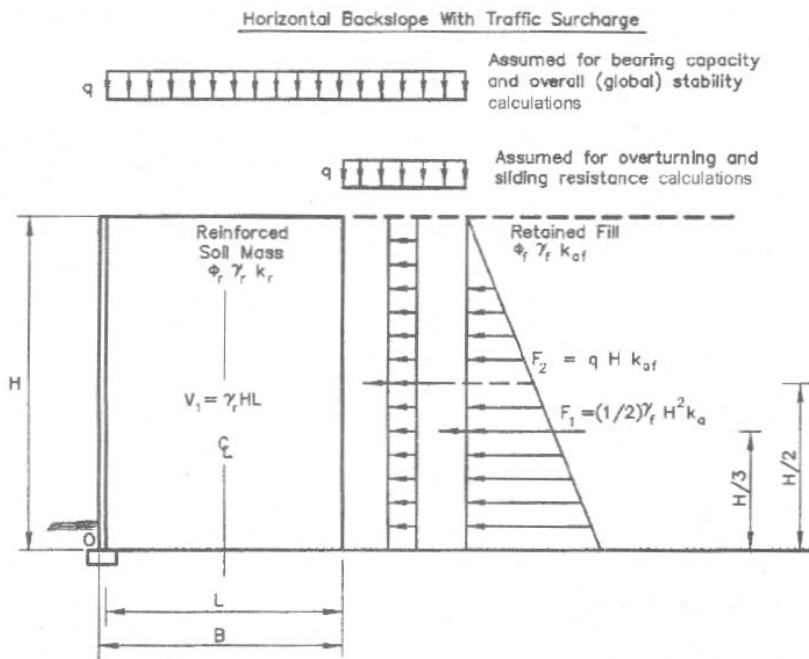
AASHTO Figure 11.10.5.2-1 – External Stability for Wall with Horizontal Backslope and Traffic Surcharge
